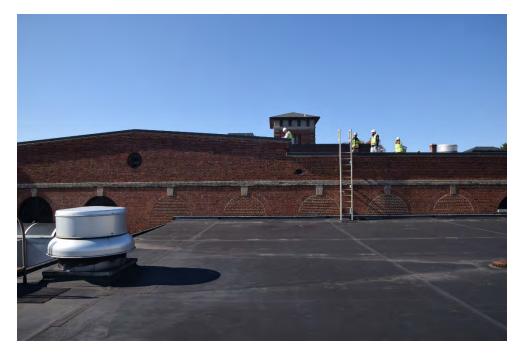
A truncated roof shelters the original north elevation and Decatur Street. Large bus openings punched in wall during the 1987-1992 renovation (BBB)
